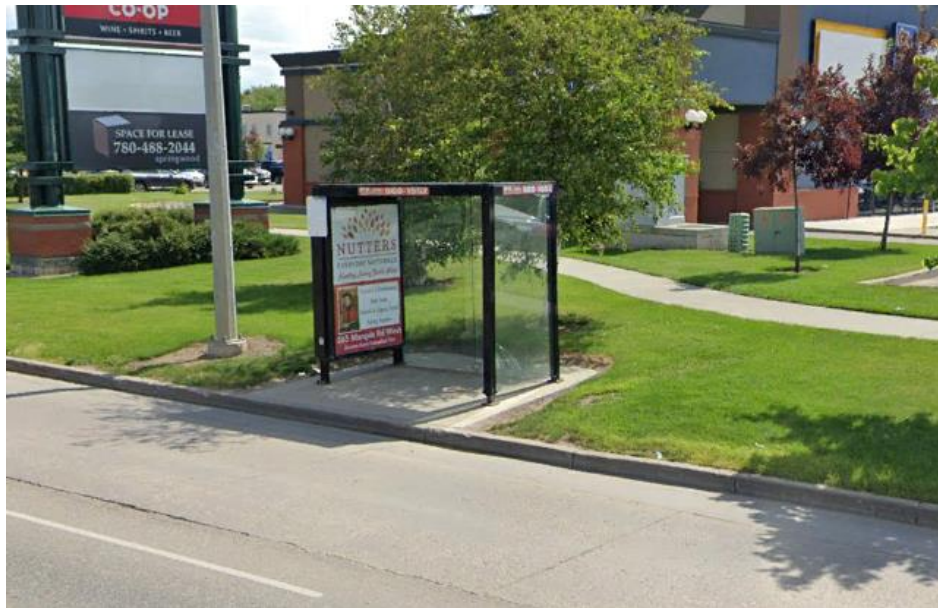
Example of Non-Accessible Transit Shelter on 15th Street East (summer)
